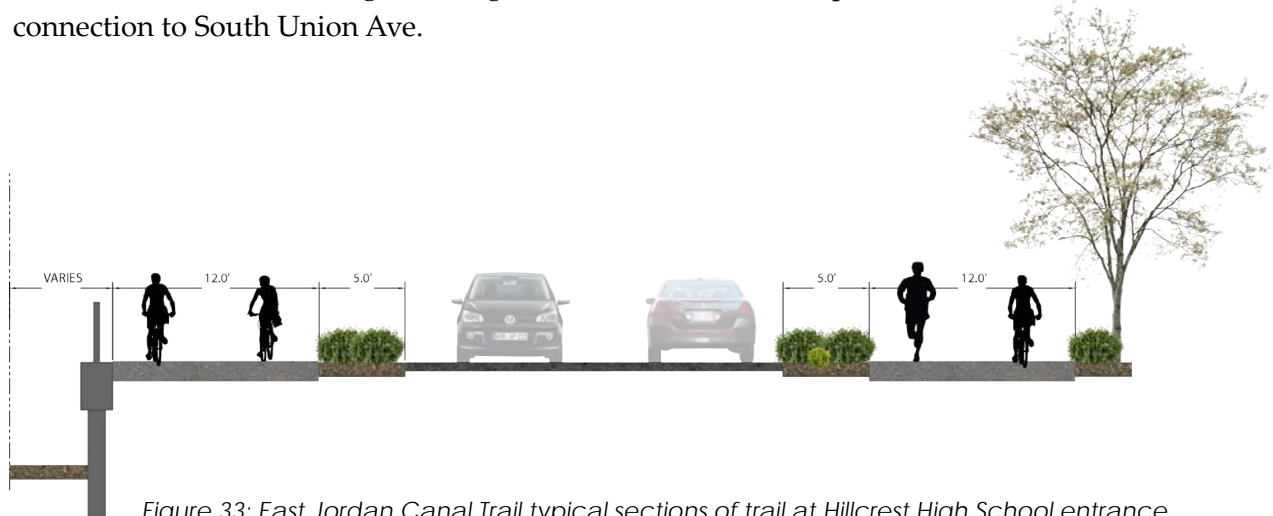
East Jordan Canal Trail typical sections of trail at Hillcrest High School entrance.
